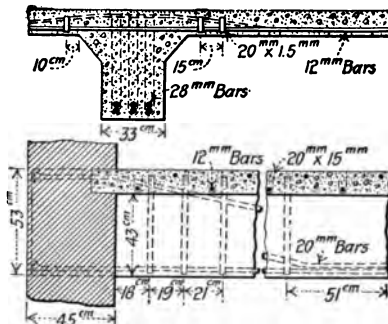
Floor Petit Palais des Beaux Arts, Paris, France.
